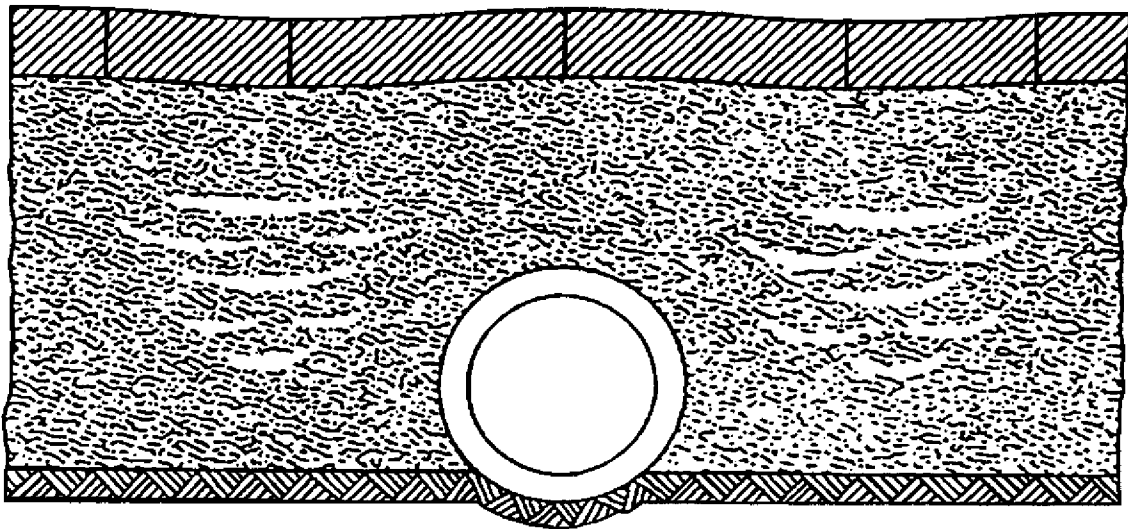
Pavement failure due to inadequate compaction or material quality adjacent to rigid pipe. [Source: *Effects of Loads on Storm Drains and Culverts*, U.S. Army Corps of Engineers]
